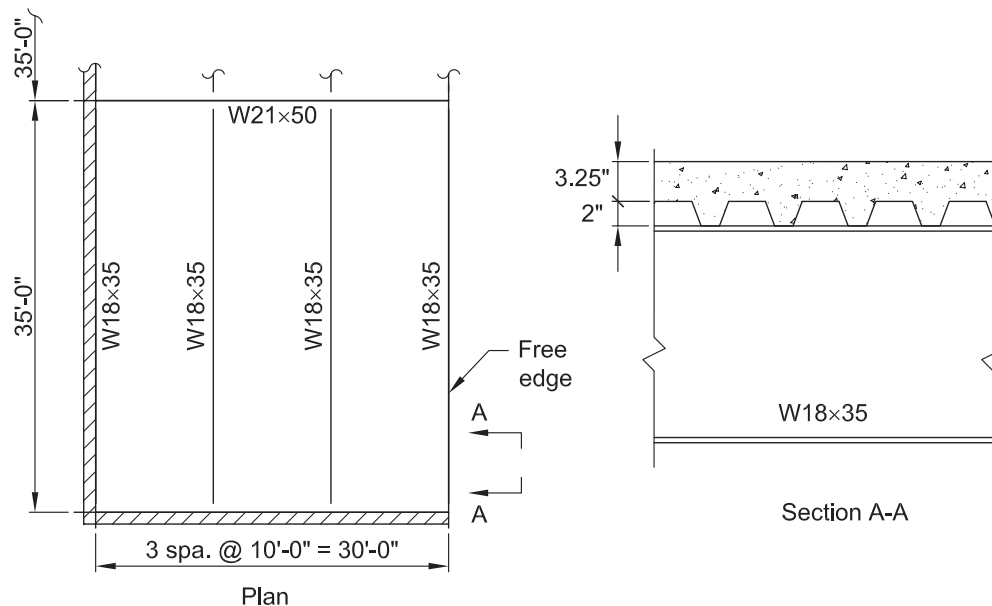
Mezzanine with edge beam member framing details for Example 4.3.
